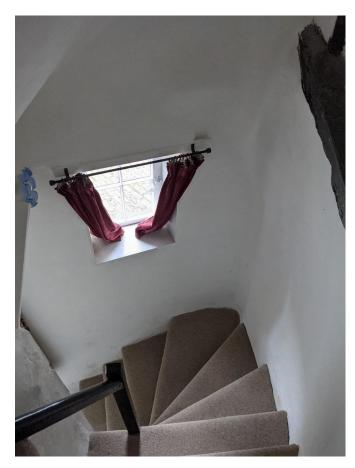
The ground floor to first-floor stairwell and interior view of the first-floor 18th century casement window. Note the slanting party wall with the Harlequin on the right hand side of the photograph. Part of the timber frame can be seen in the top right hand comer.
